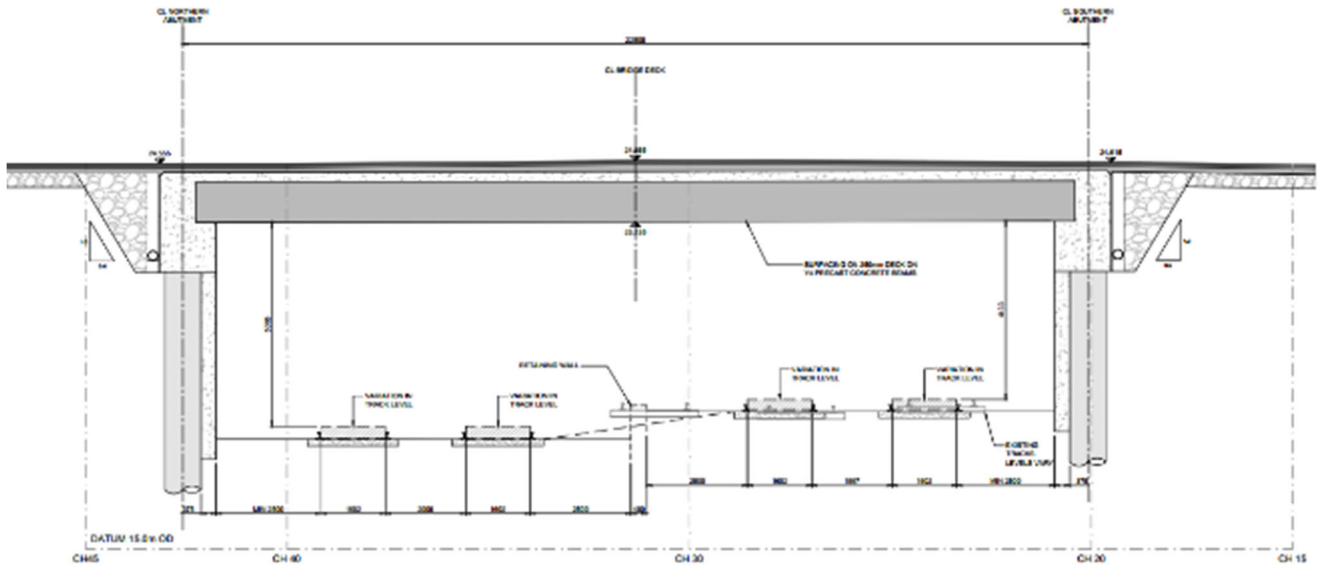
Memorial Road Bridge (OBC3) Bridge Deck Longitudinal Section
